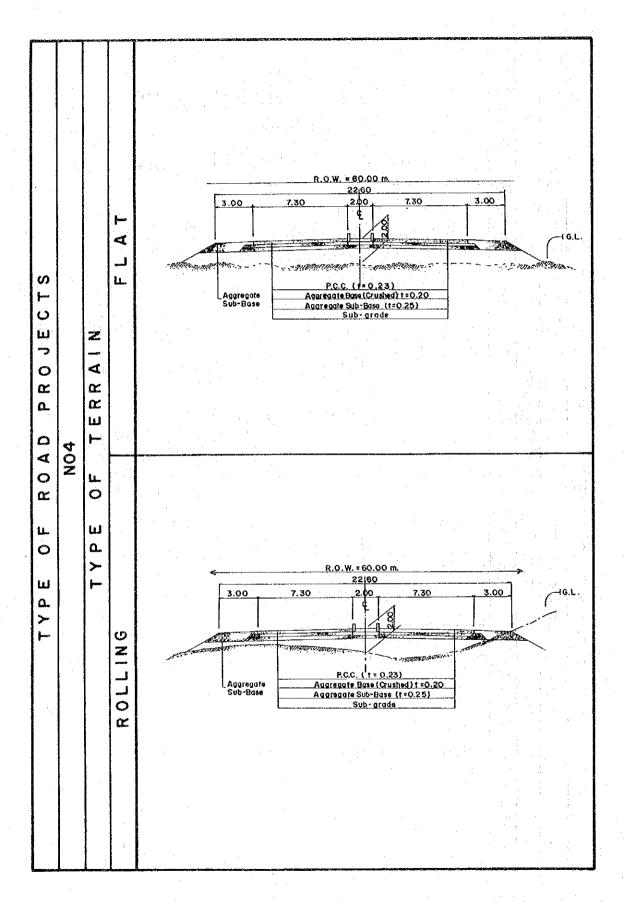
(3) TYPICAL ROAD CROSS-SECTION
